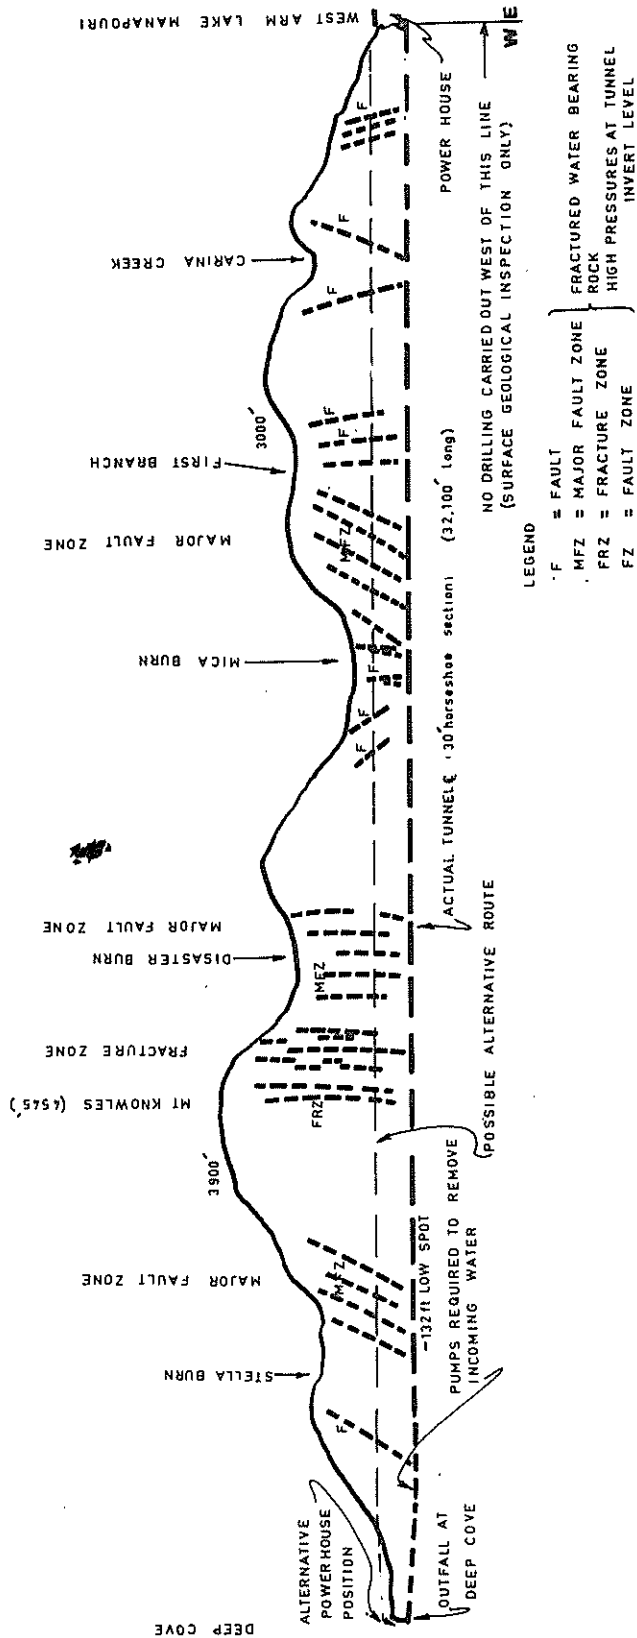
ELEVATION ALONG LINE OF TUNNEL
